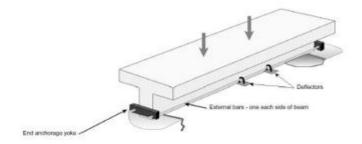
Typical strengthening technique of RC beams with external reinforcement
